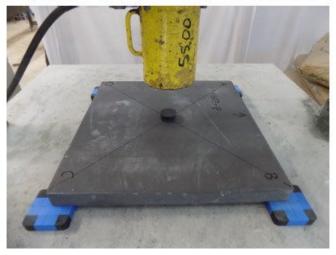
Corner Supported, Center Point Loading Testing Conditions
